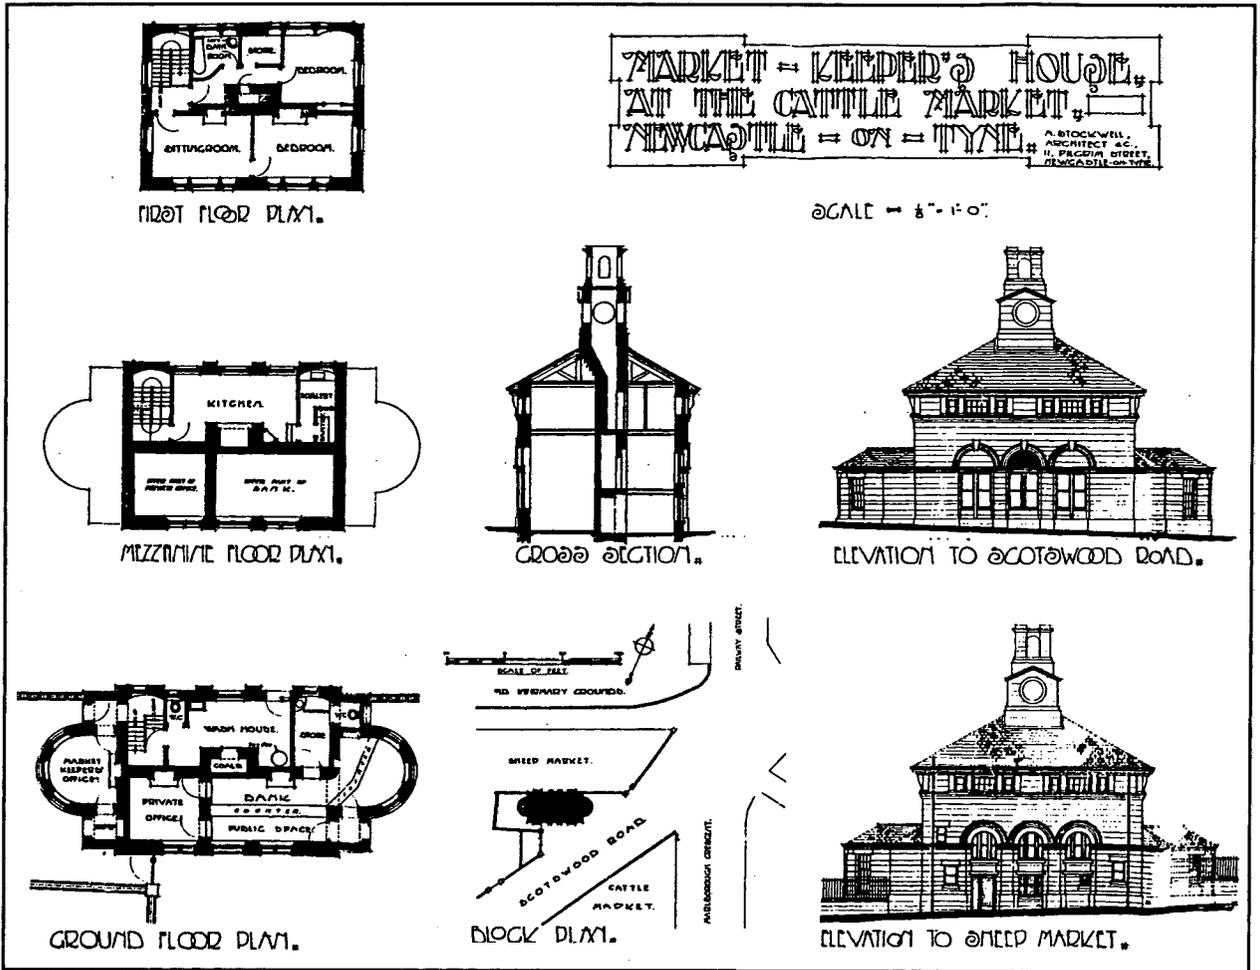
1910 City Engineer's microfilm A241; plans by A. Stockwell of existing building.
